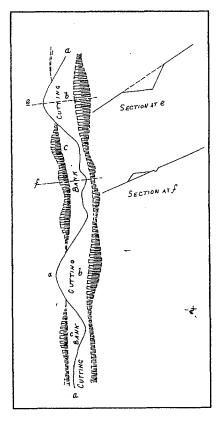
"Contouring a road on surface gradients"; Dobson's illustration of cutting and filling. Source: Edward Dobson, Pioneer Engineering, (1877), p46.
